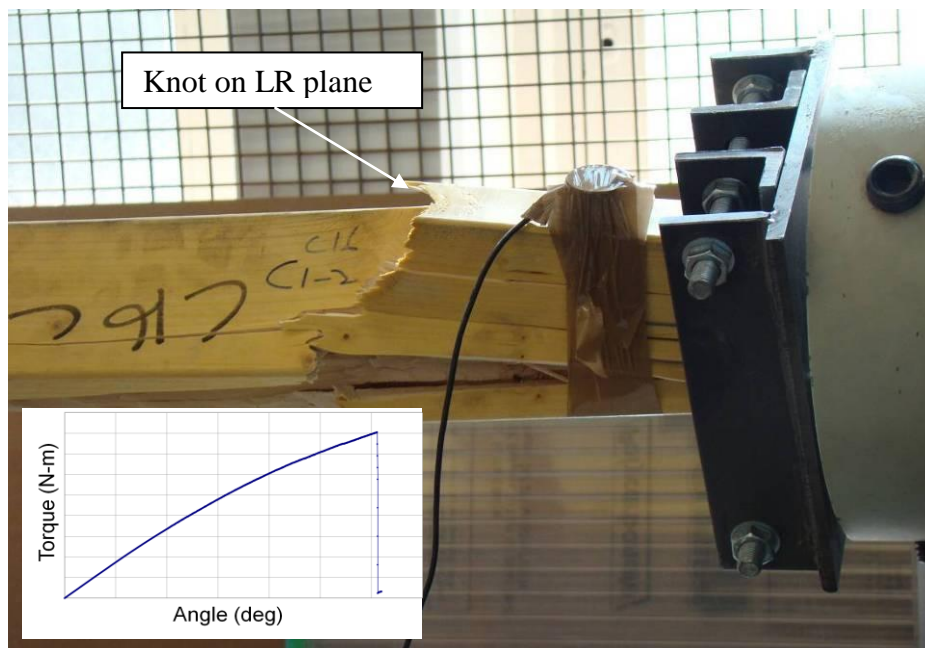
A sudden crushing failure in NS C16 joist due to a knot at LR plane
